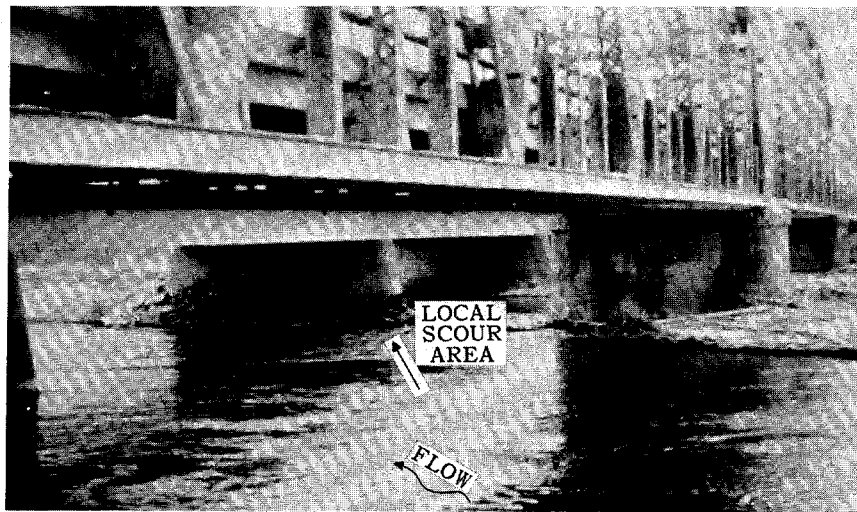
Scour at pier 2 of downstream bridge. (From Idaho Dept. of Transportation.)
